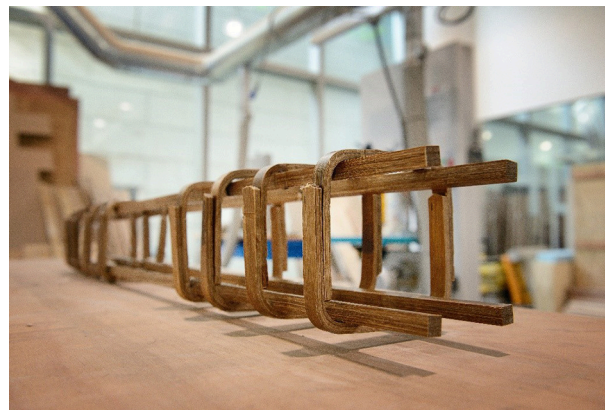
| Bamboo composite reinforcement system used for reinforcing concrete beam.
